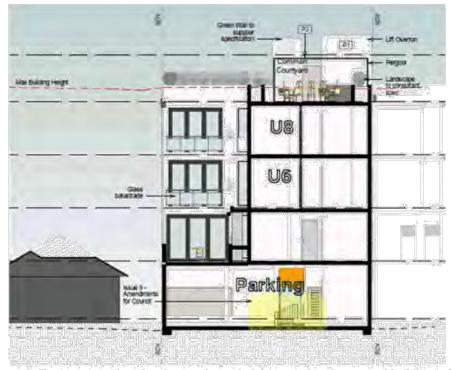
East-west section showing maximum height control and proposed building height and neighbouring building profile
